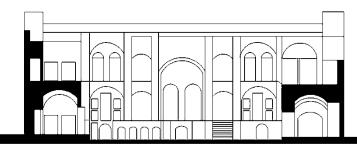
Section A-A of a traditional building in Dezful (Ghobadian, 2009)
